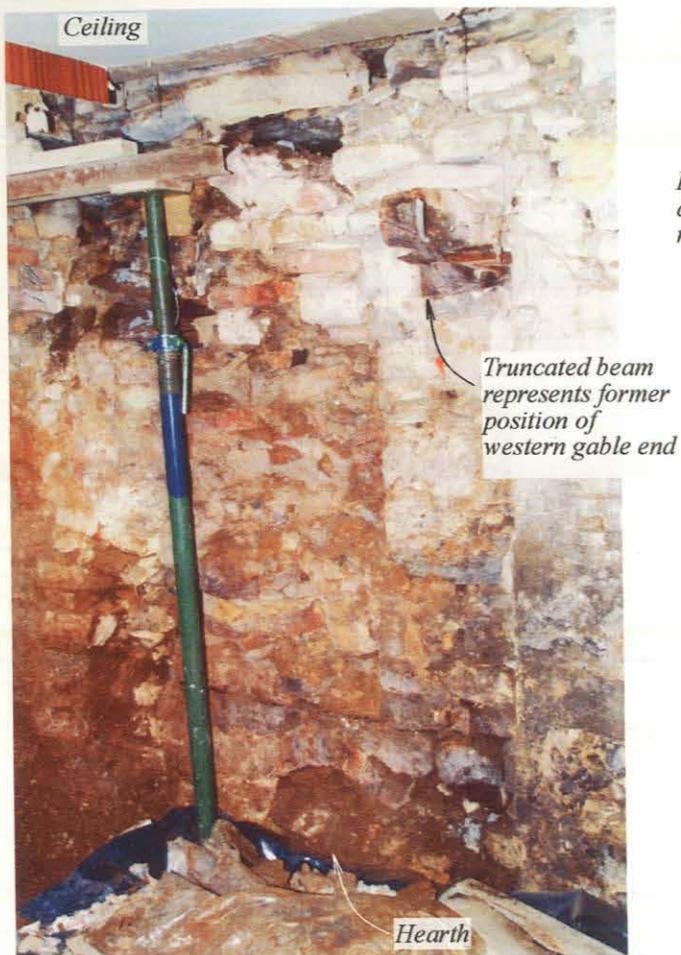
Room 65/4, no.65; exposed west end of north wall after "opening-up".
